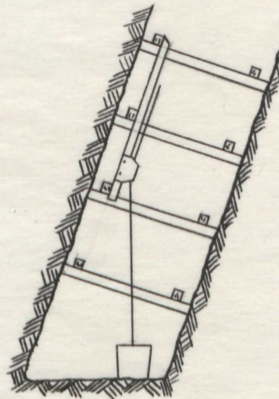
Bucket and trolley used for mucking incl. shafts.
